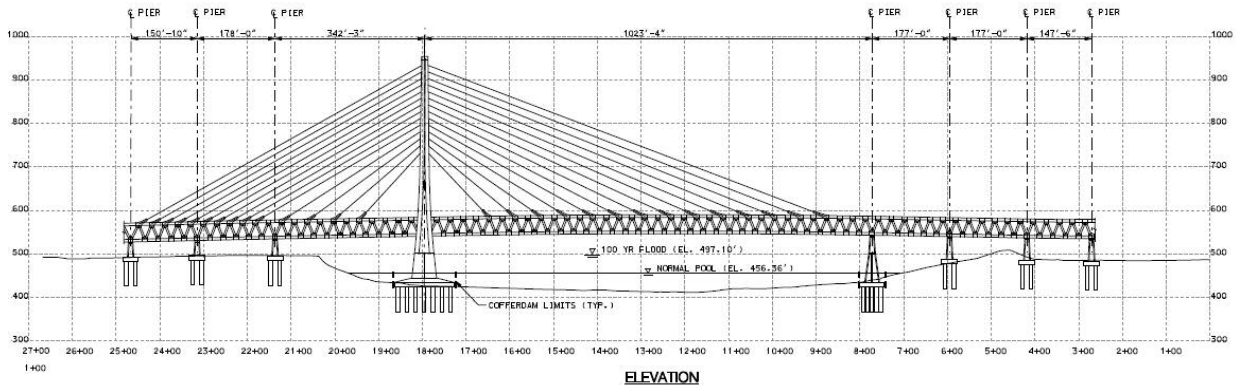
Alternate 6 – Single Tower Cable-stayed Bridge
